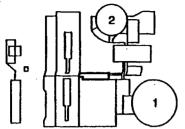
Control Building Elevation 15' - 0" Zone 14 - Switchgear Room
